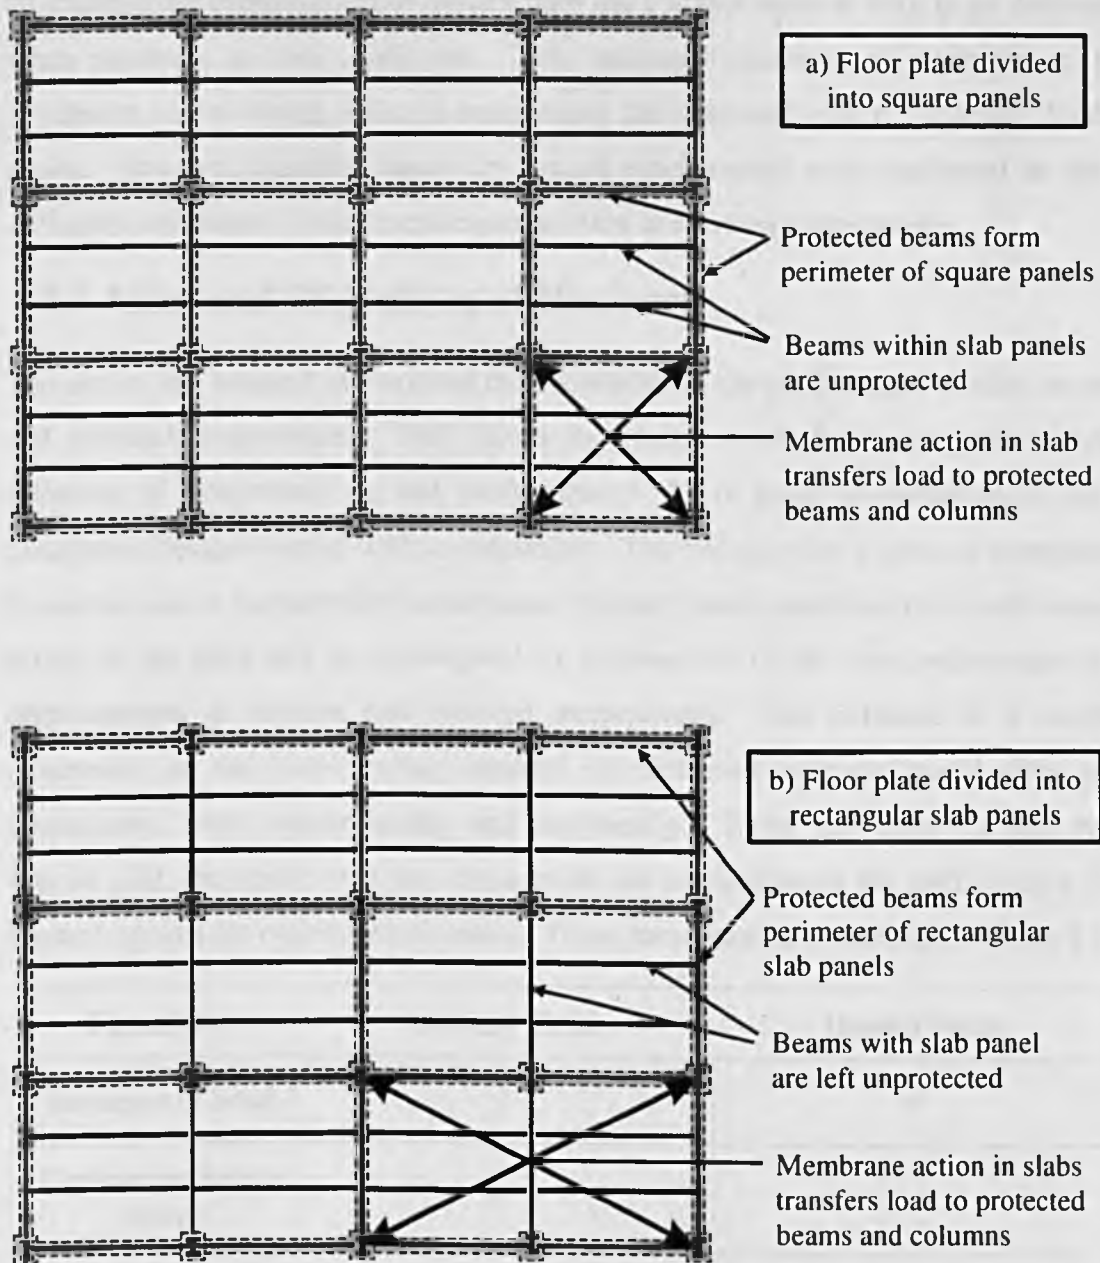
Two options for dividing the floor plate into slab panels to ensure membrane action in the floor slab during a fire, (a) Floor plate divided into square panels and (b) Floor plate divided into rectangular slab panels.
